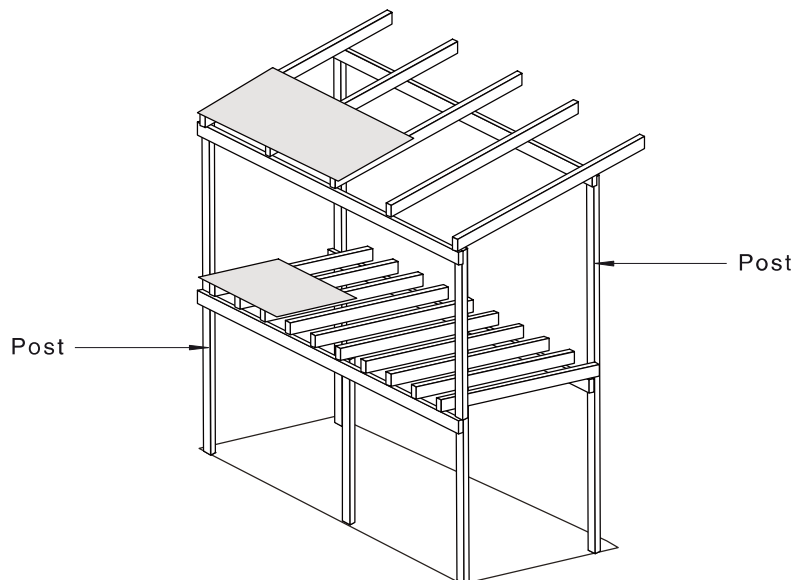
POSTS SUPPORTING ROOF AND/OR FLOOR LOADS
